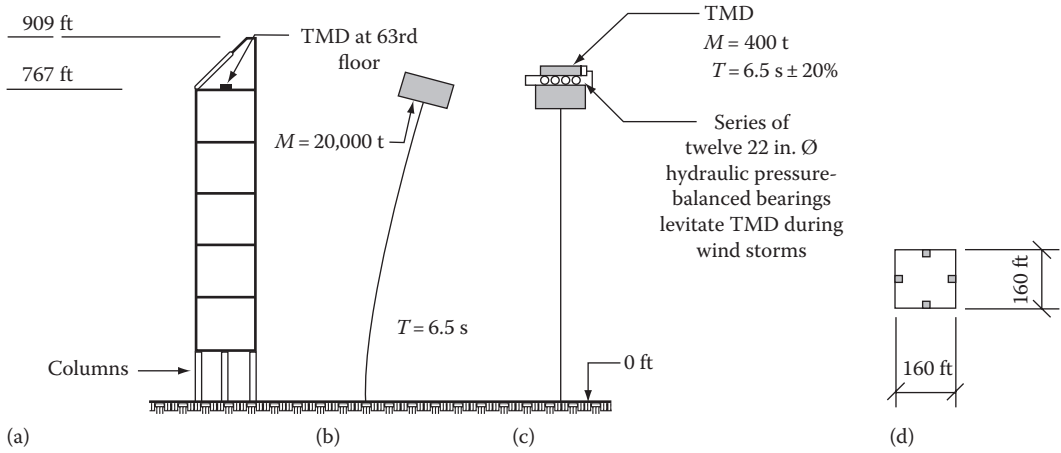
Tuned mass damper (TMD) for Citicorp, New York: (a) building elevation, (b) plan, (c) first-mode response, and (d) TMD atop the building.
